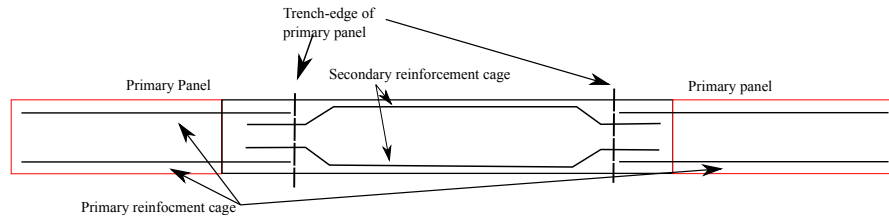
Example on how horizontal reinforcement in between D-wall panels can be conducted, redrawn from Alén et al. 2006
